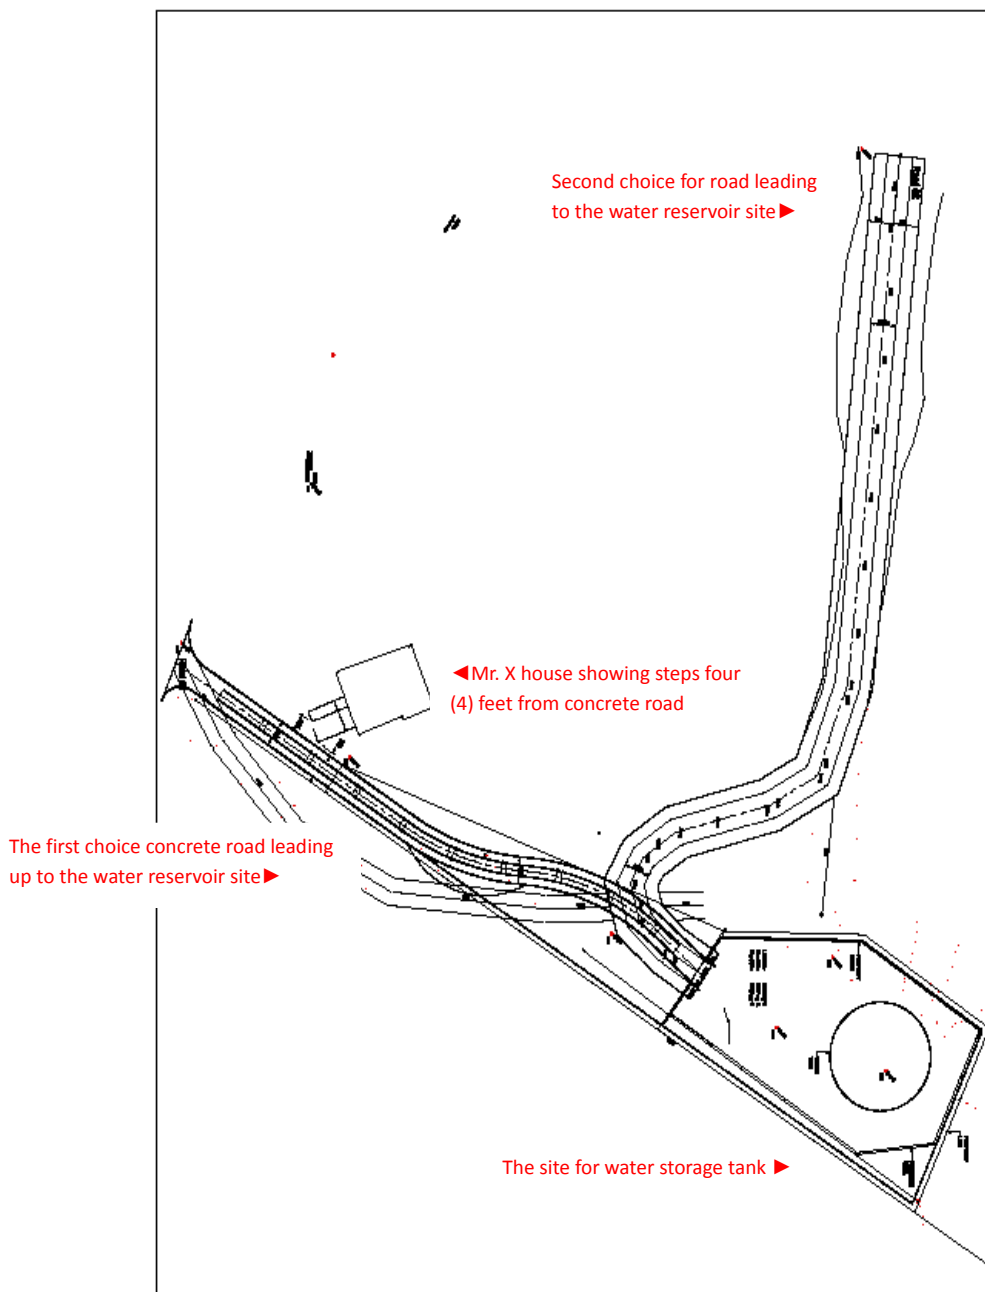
Images of the two options of proposed roads leading to the site for the water reservoir. The straighter and shorter proposed road nearest to the house was chosen
